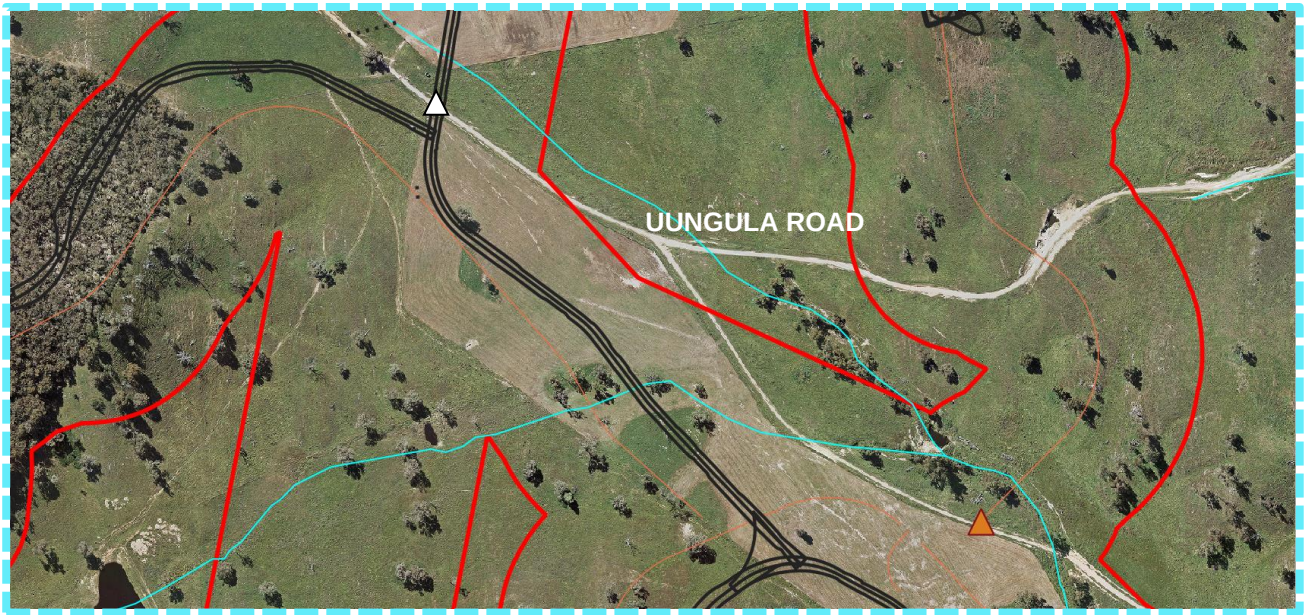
Secondary intersection relocation on Uungula Road. Concept access road design shown in black. Approved project layout road centreline shown in orange.
